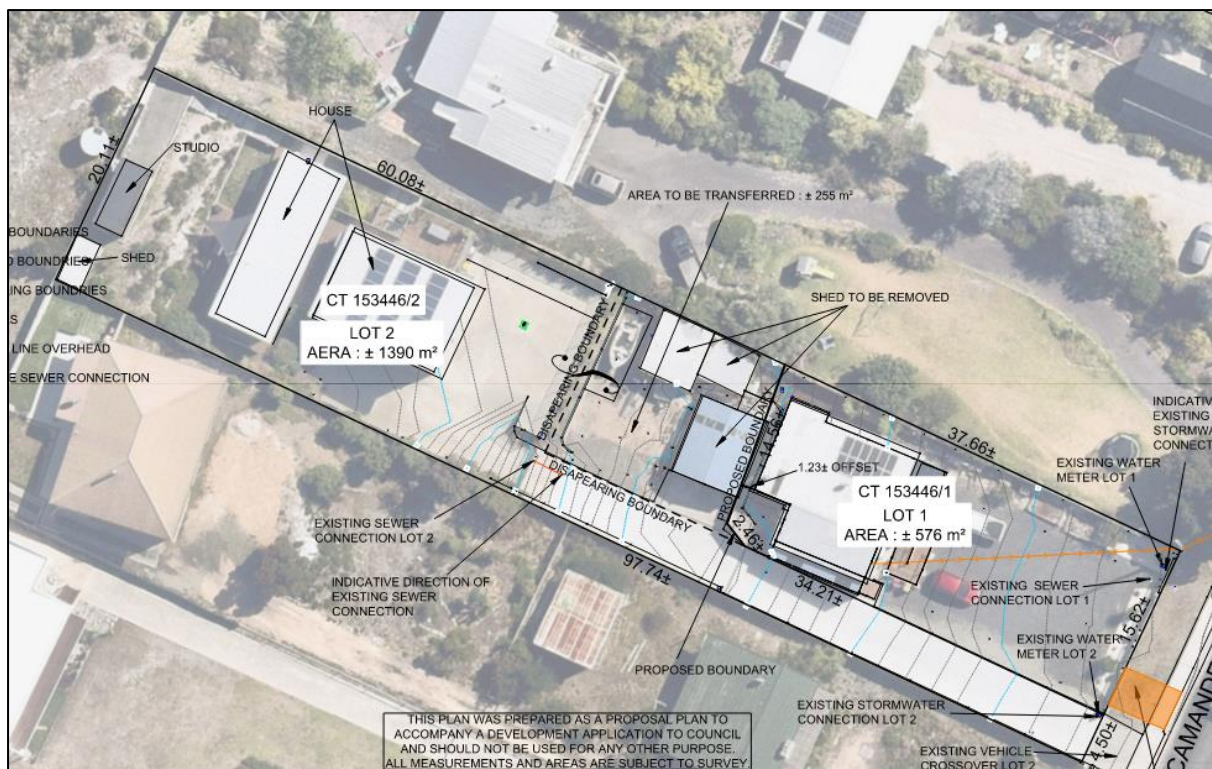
Proposal Plan. Source: Nova Land Consulting
